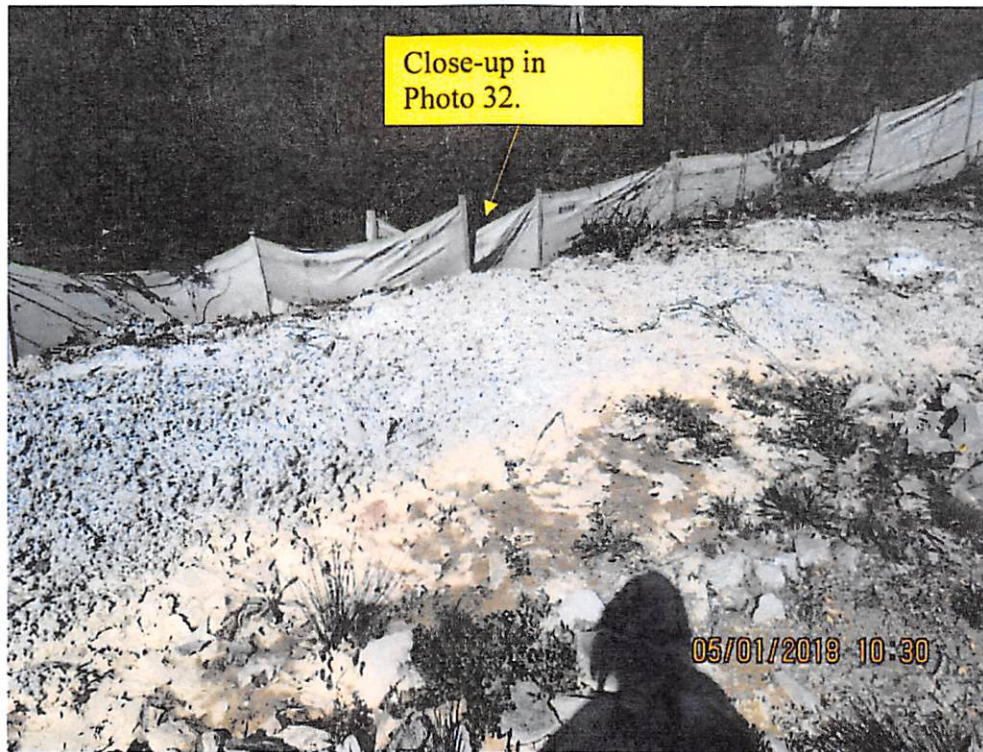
Sediment deposits on stone ring around sediment basin outlet.
